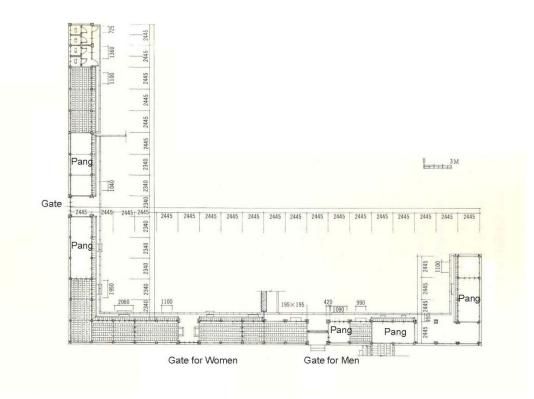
Middle Haengnangchae Floor Plan (N. Zu 2003)
